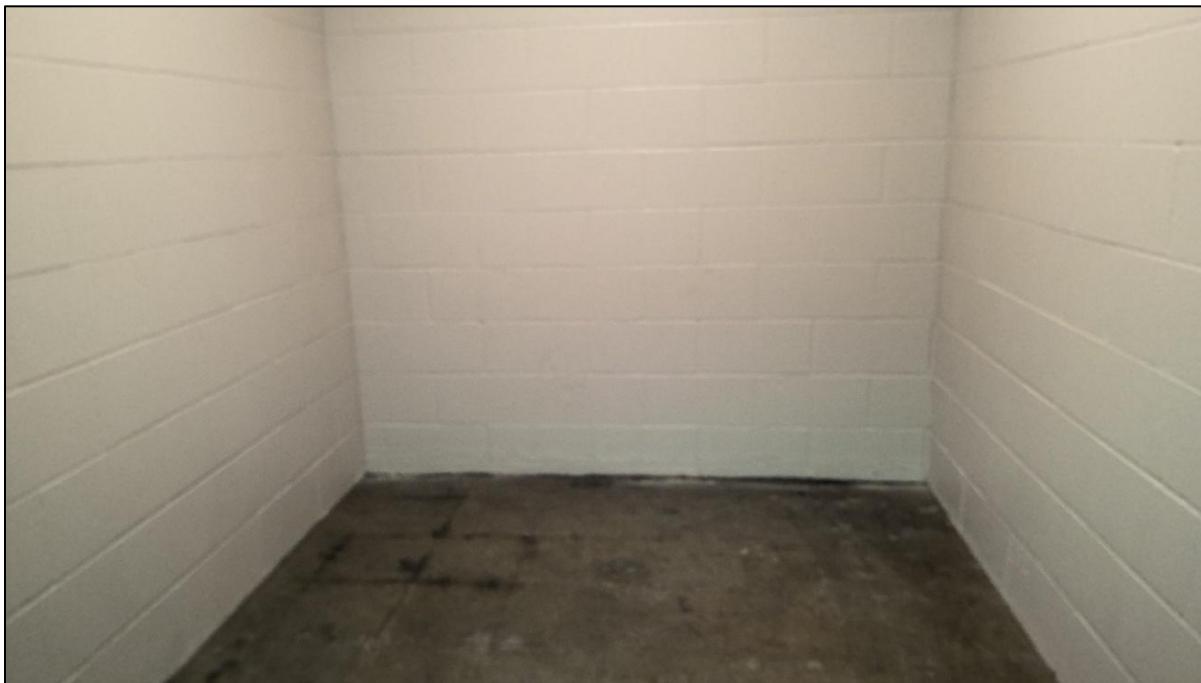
Detail seclusion room floor which appears to be damp and/or stained. The pattern of damage is in a grid pattern, perhaps indicating a tile floor finish was removed at some point. Rochester Phoenix Academy – Rochester, MN.
